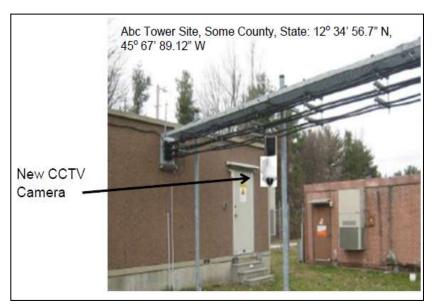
Ground-level photograph with graphic showing proposed equipment installation.
